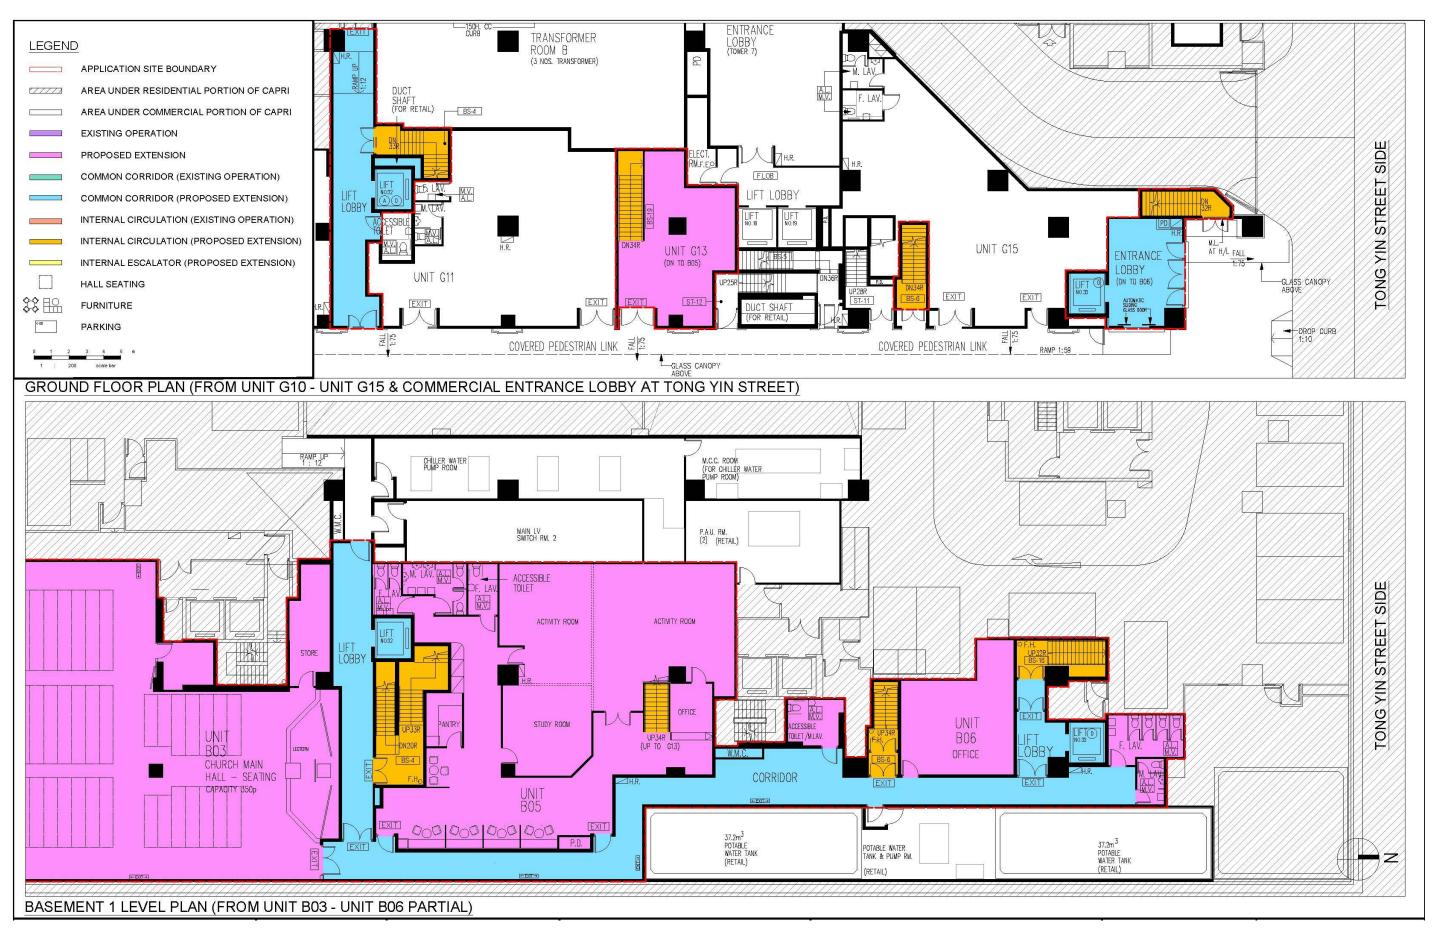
Proposed Uses at Northern Portion of Ground Floor and Basement Level 1
